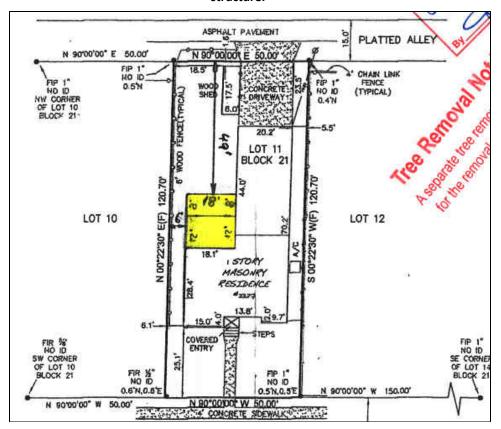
Survey with proposed addition located in the yellow highlighted portion.
